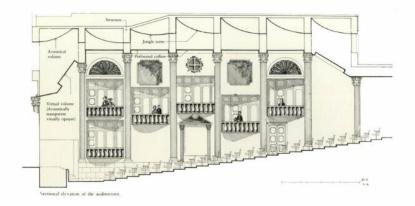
Sectional elevation of the auditorium Photo credit: Aga Khan Trust for Culture
